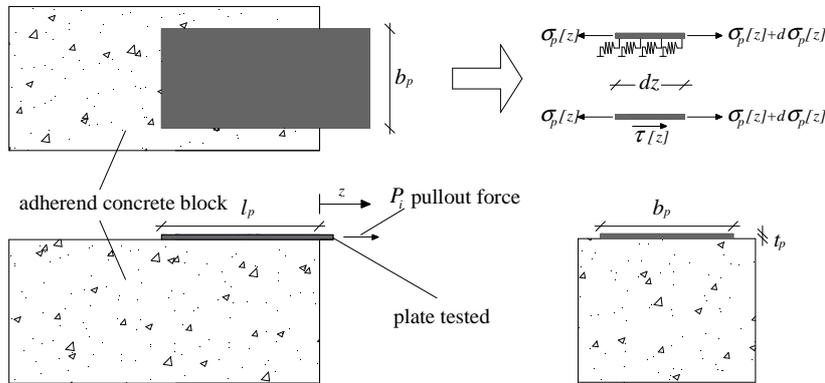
Single-lap shear test of a FRP-to-concrete bonded joint.
